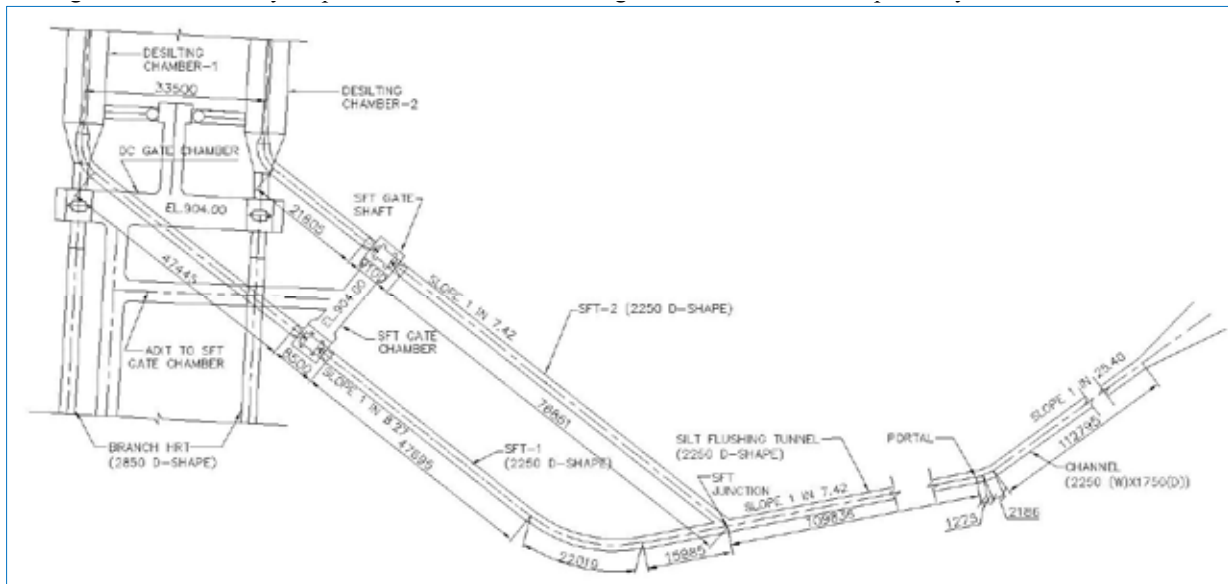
Silt Flushing Tunnel and Channel Layout Plan
